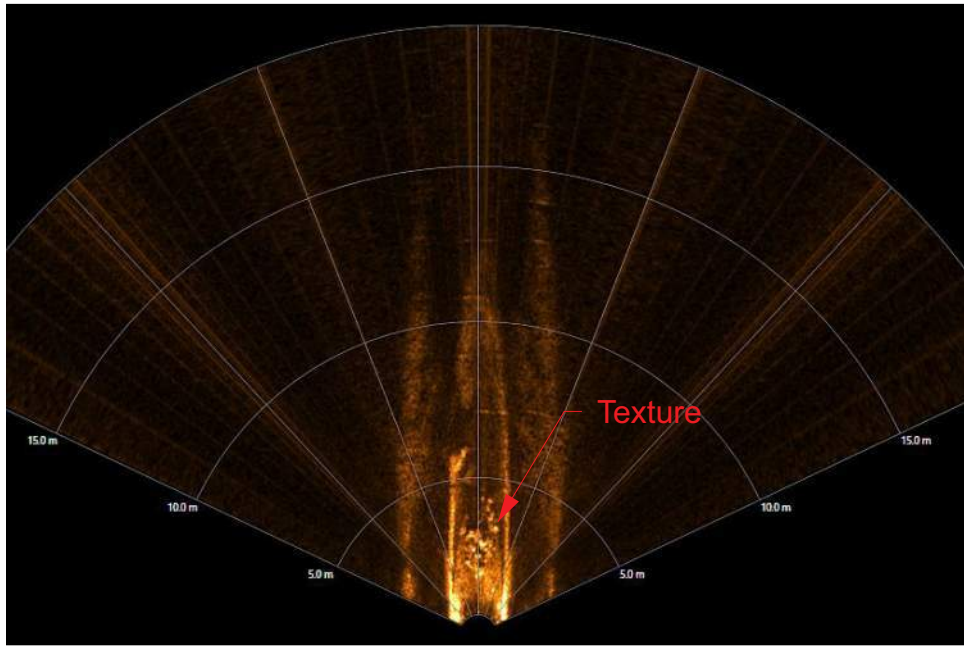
Sonar image at 645 feet downstream of Access Point 1. Texture on invert 7 feet ahead.
